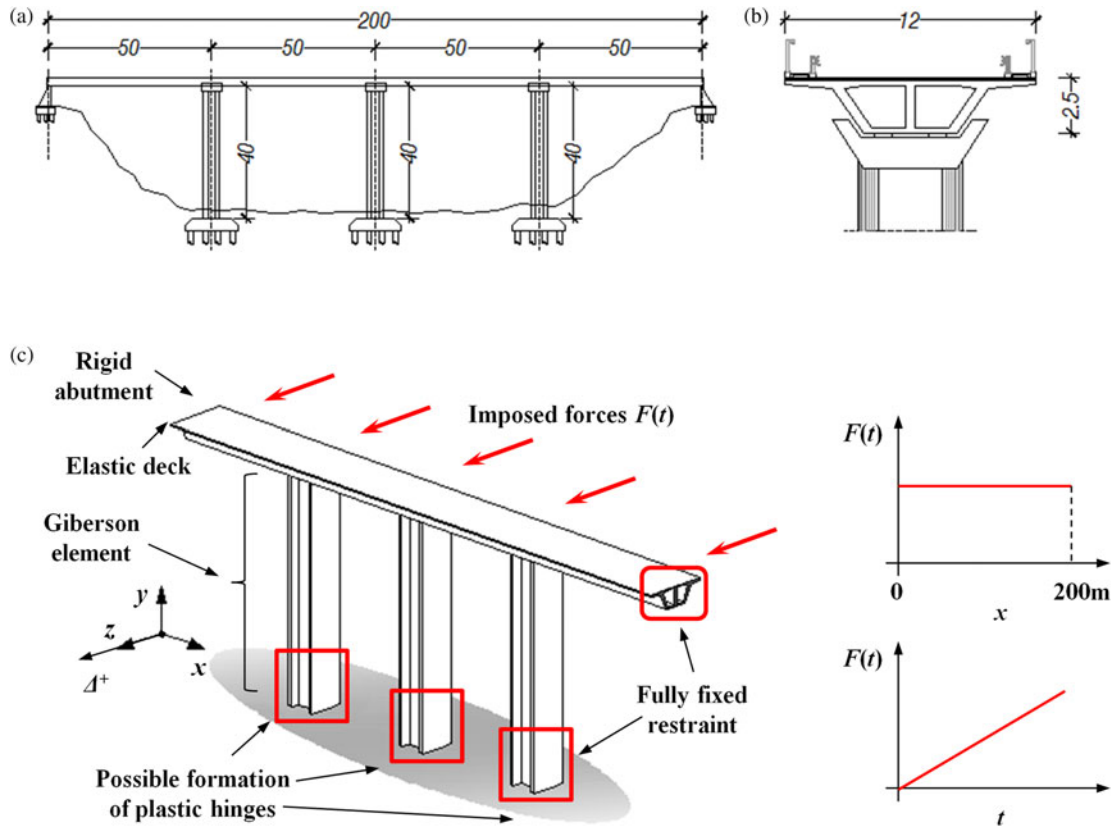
Bridge structure: (a) overall dimensions (in metres) and (b) deck cross-section at midspan; (c) structural modelling and applied push-over forces.
